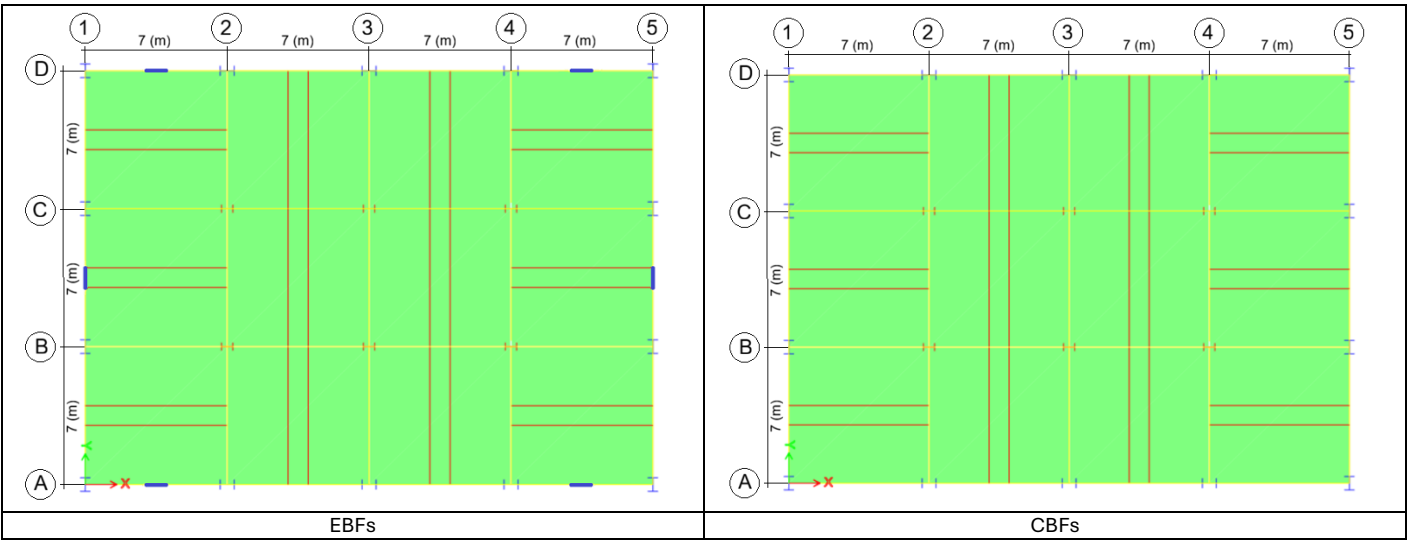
Plan layout of eccentrically inverted V-brace frames (EBFs) and concentrically inverted V-brace frames (CBFs)
